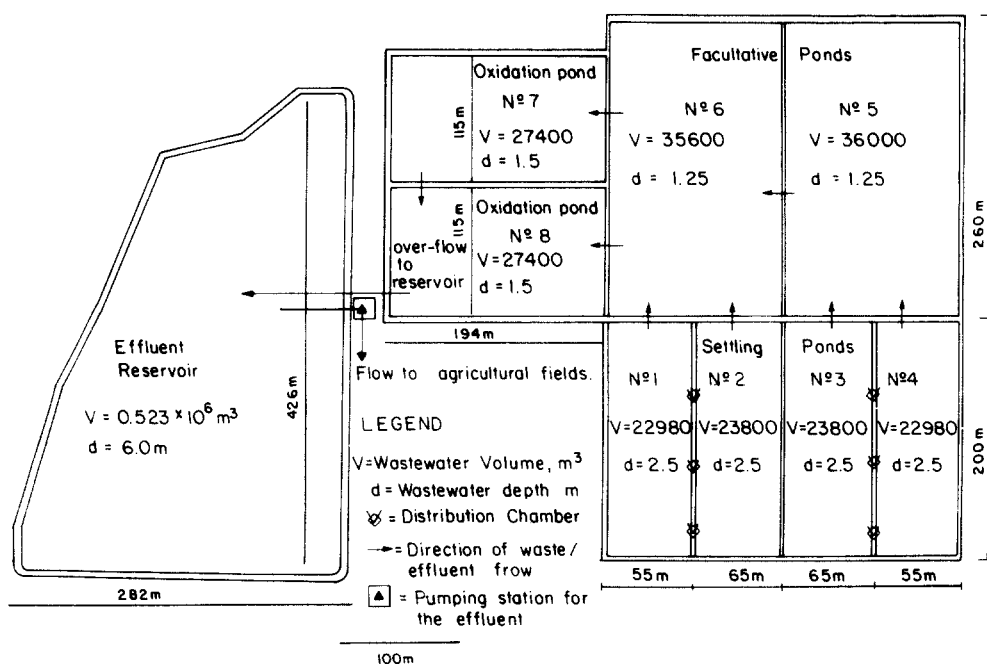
Layout of the Beer Sheva wastewater treatment plant.
